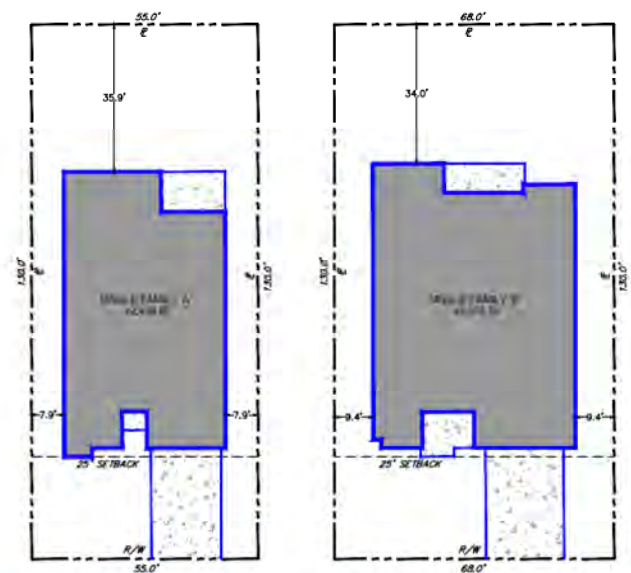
A standard ranch-style single family home floorplan of approximately 2,500 to 3,000 SF is proposed for the remaining single-family lots.
